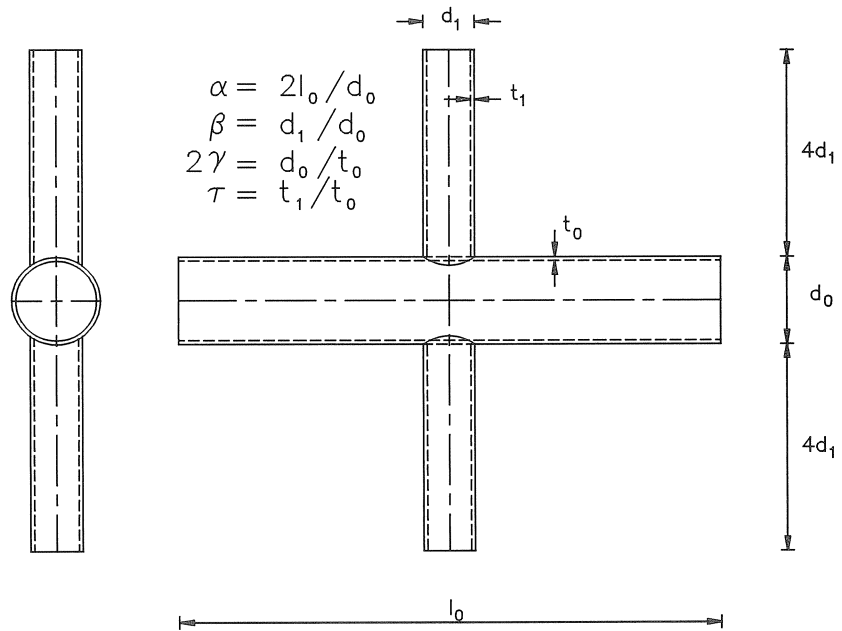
Dimensions and non-dimensional geometrical parameters of uniplanar X-joints.
